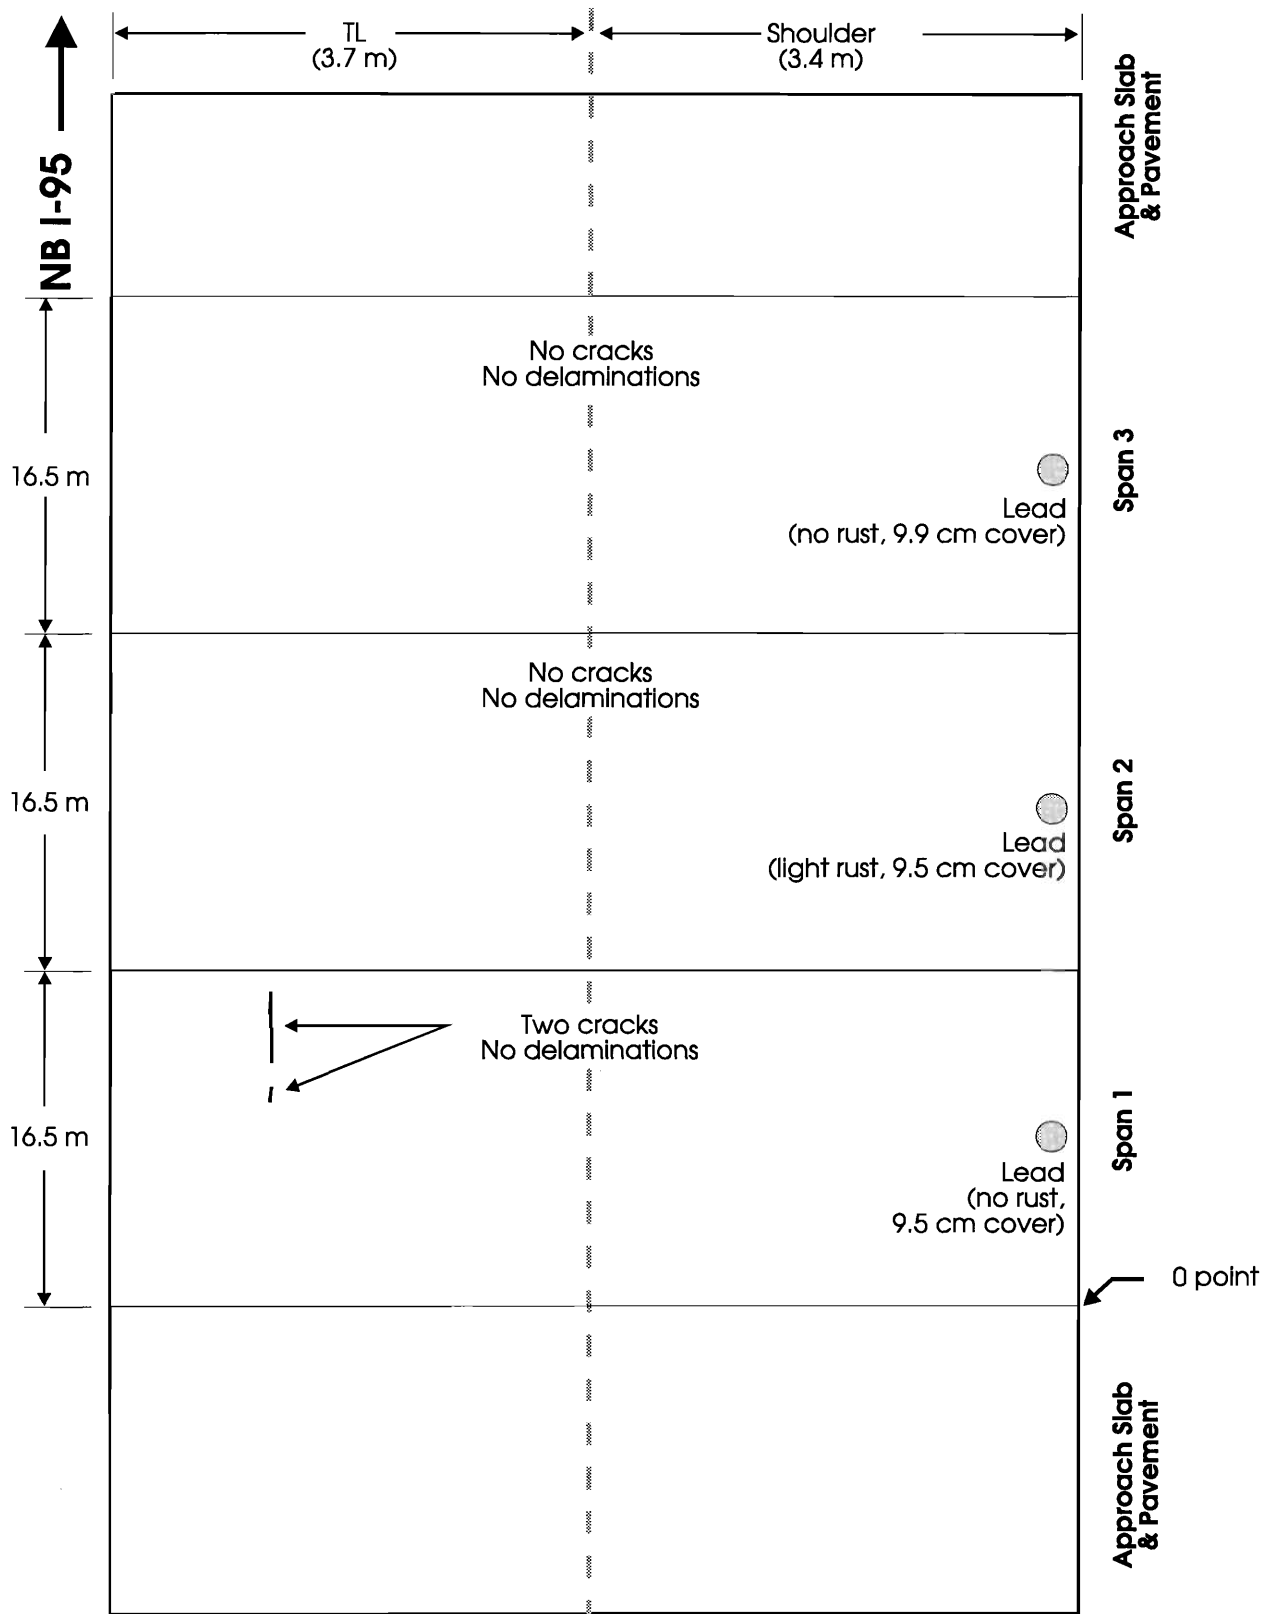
Cracks and delaminations in Bridge 4 NBL, TL and shoulder.
